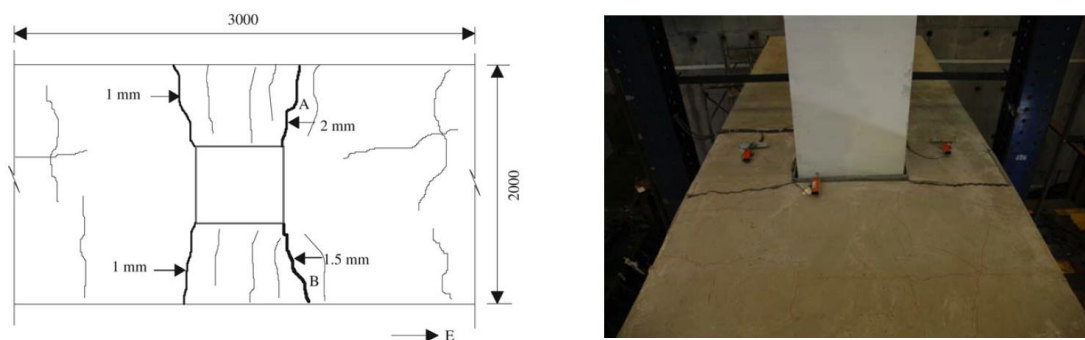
Cracking pattern at beam-column-joint (Chou et al. 2008)
